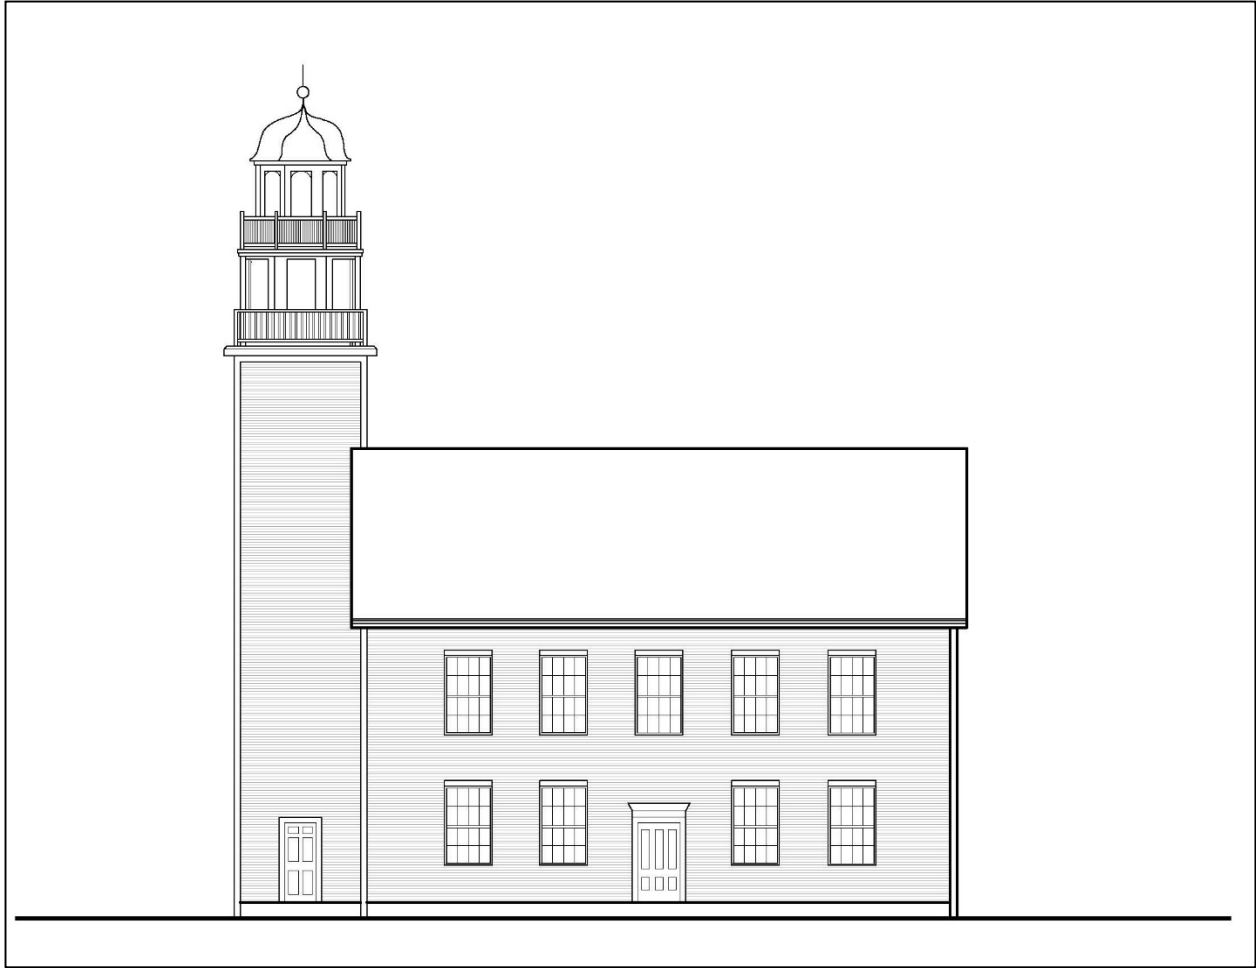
Conjectural south elevation (now east) of the Greenfield Meetinghouse with the 1825 tower, after the 1848 renovation
